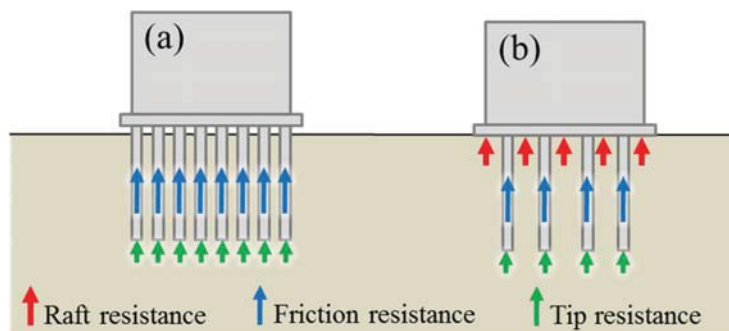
(a) Pile foundation, (b) Piled raft foundation.
